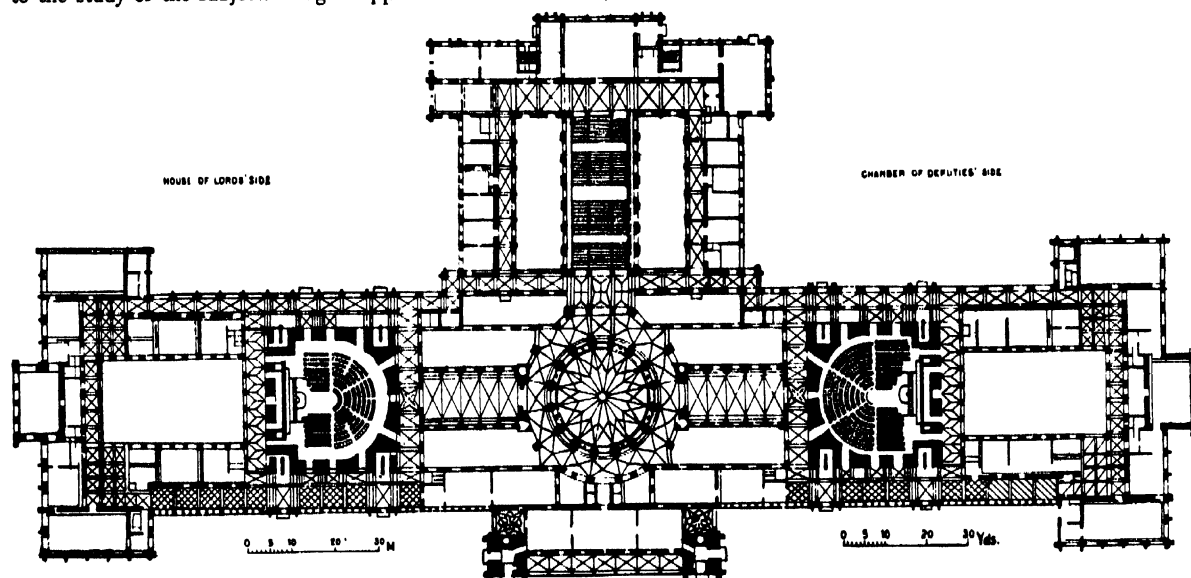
Plan of the Parliament House, Budapest. (Steindl.)
